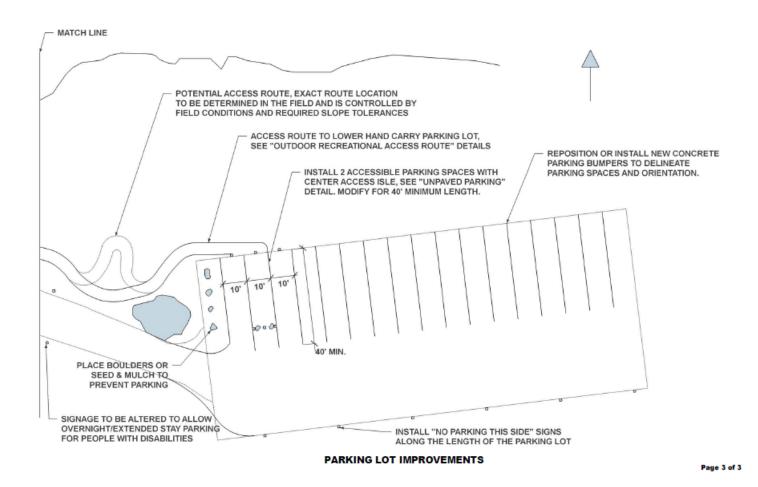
Site plan details for the construction of the accessible parking spaces for vehicles with trailers at the Cranberry Lake BLS.
